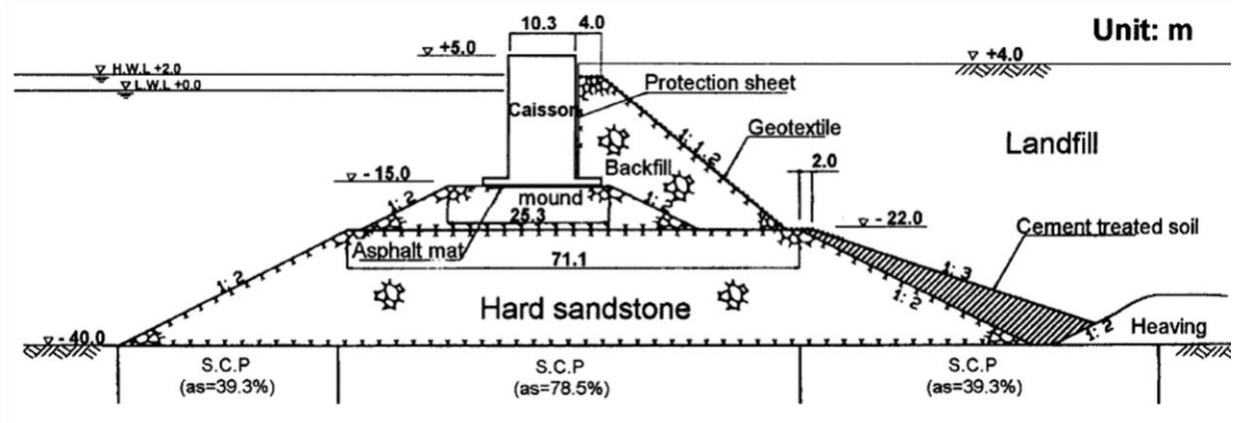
Cement treated soil using as slope protection Tang et al. (2001)
